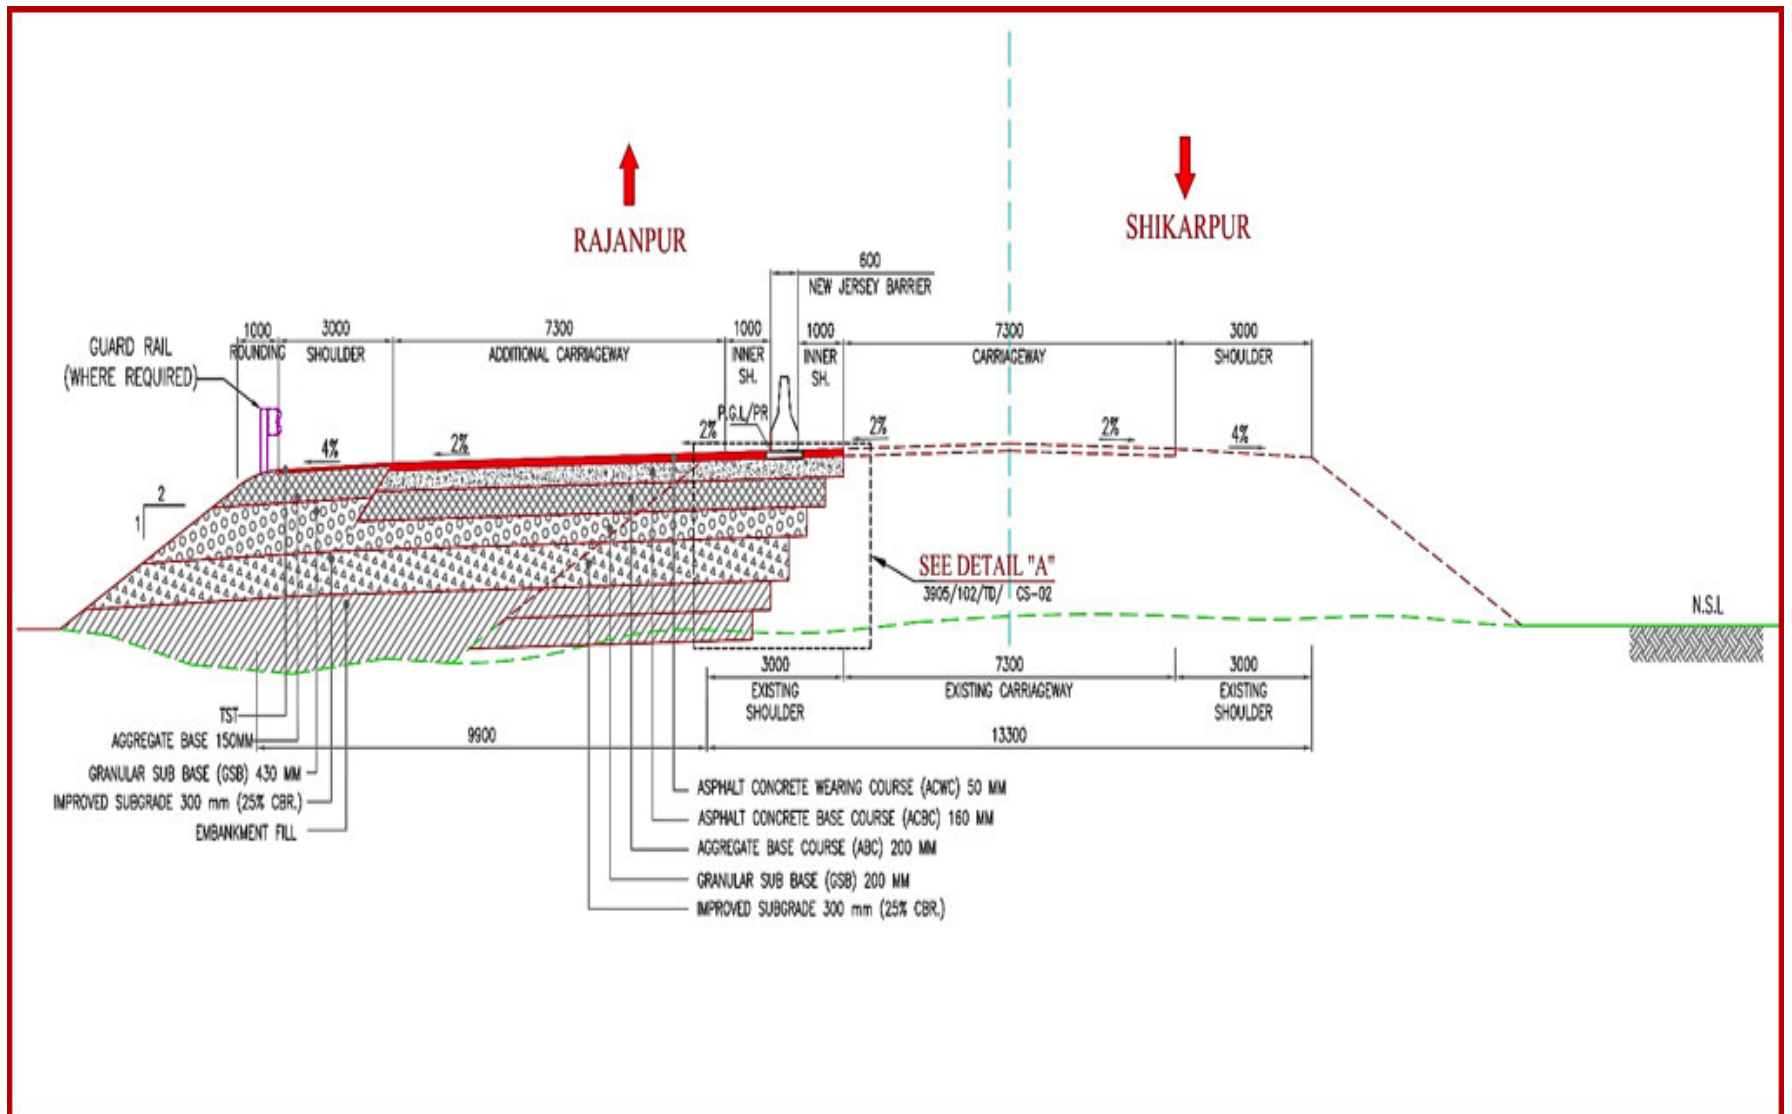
(a) : Typical Cross Section for Additional Carriageway
